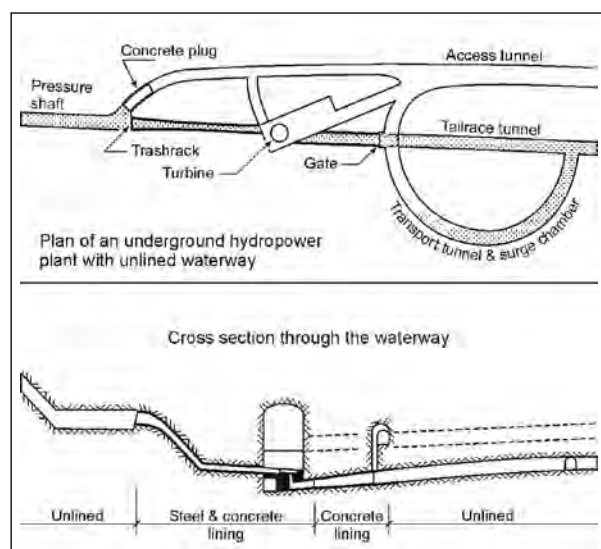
Plan and cross section of an underground hydropower plant with unlined waterways.
